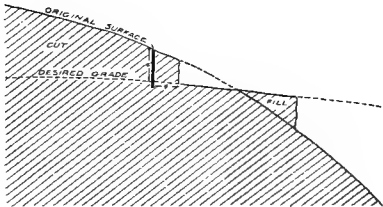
PLAN OF APPROXIMATE LOADING FOR CUT WORK
